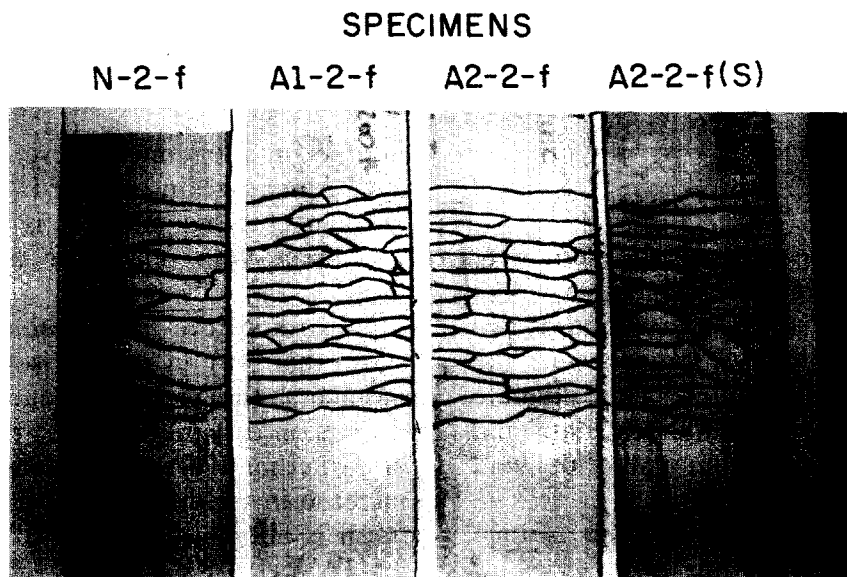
Cracking pattern in specimens with M2 mesh and without transverse wire spacing — specimens; N-2-f; A1-2-f; A2-2-f; and A2-2-f (S).
